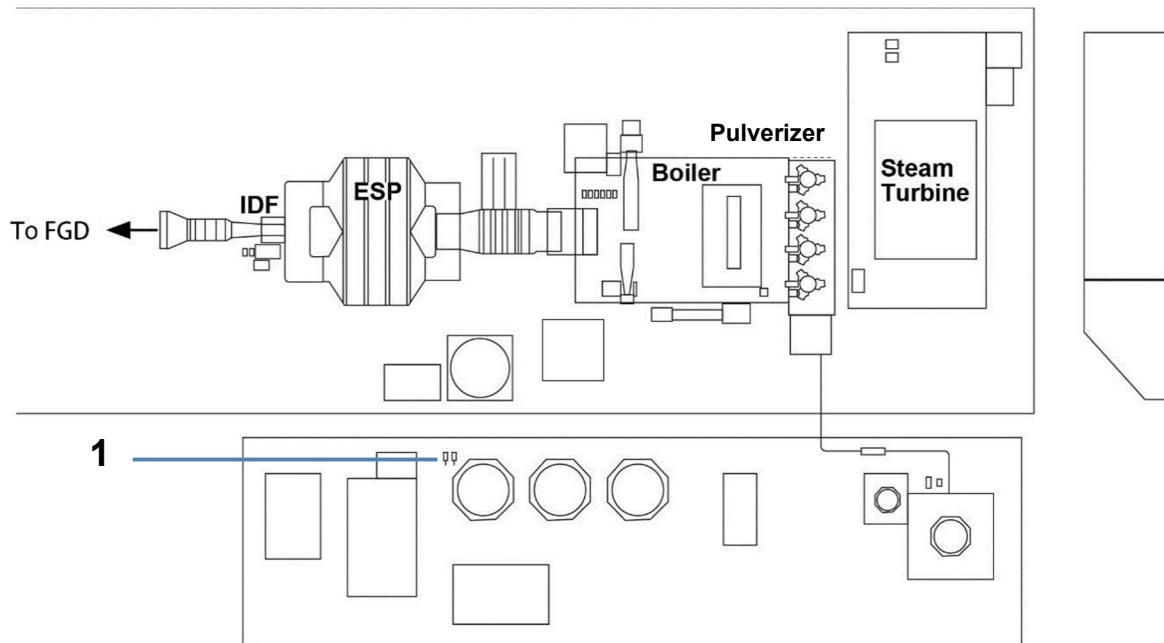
Service Water System Arrangement (Typical arrangement example)
